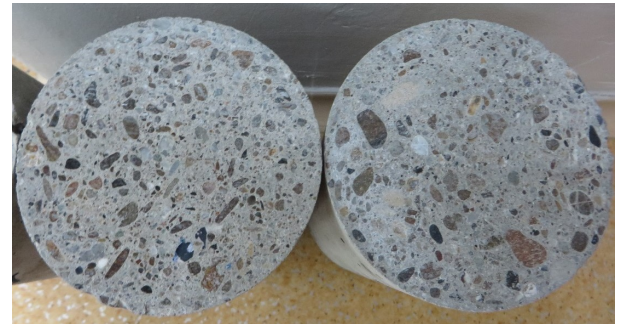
The specimens end surfaces machining for a perfect contact with loading plates of the testing machine/ *Prelucrarea mecanică a capetelor probelor pentru un contact perfect cu platanele mașinii de încercat.
